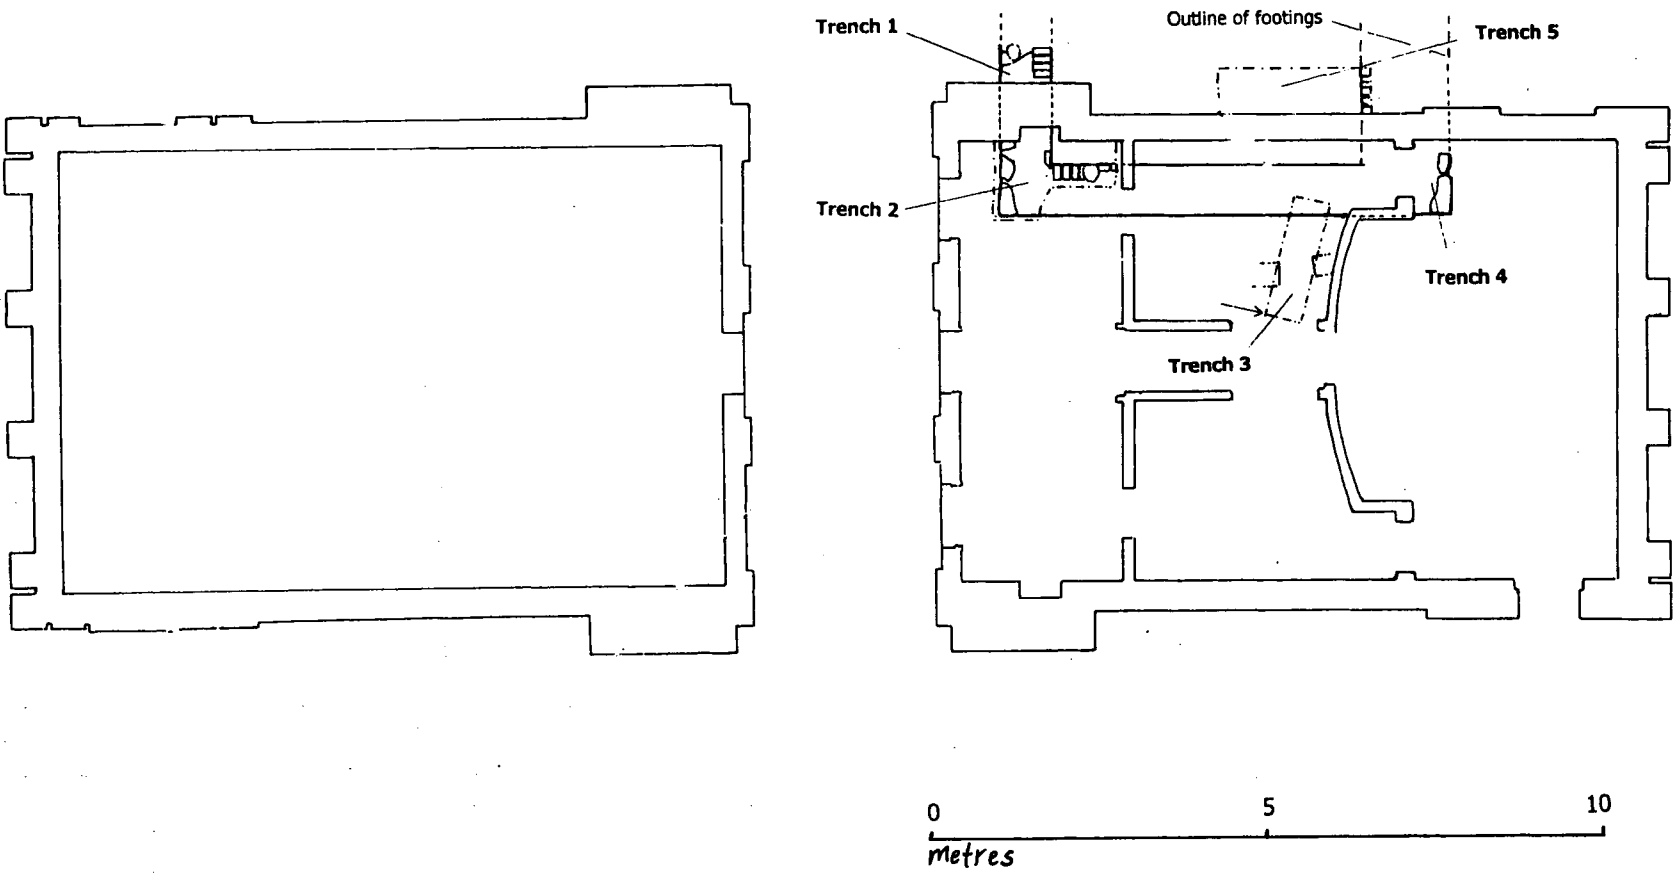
Buscot Park. Plan of the footings of the Orangery beneath the south-east pavilion.
